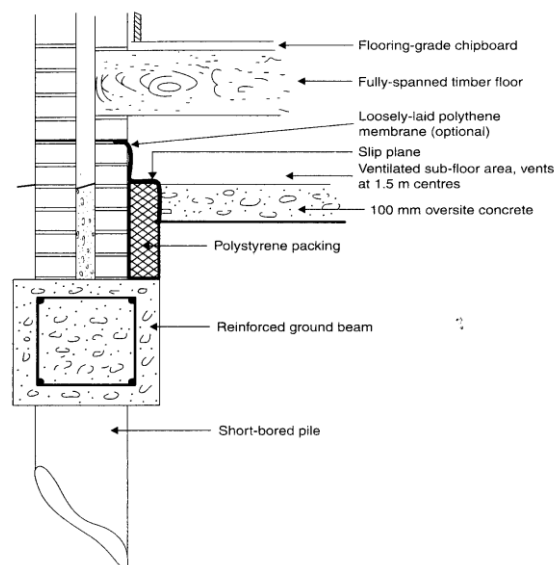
Modern short-bored pile foundations type (Glover, 2006)
